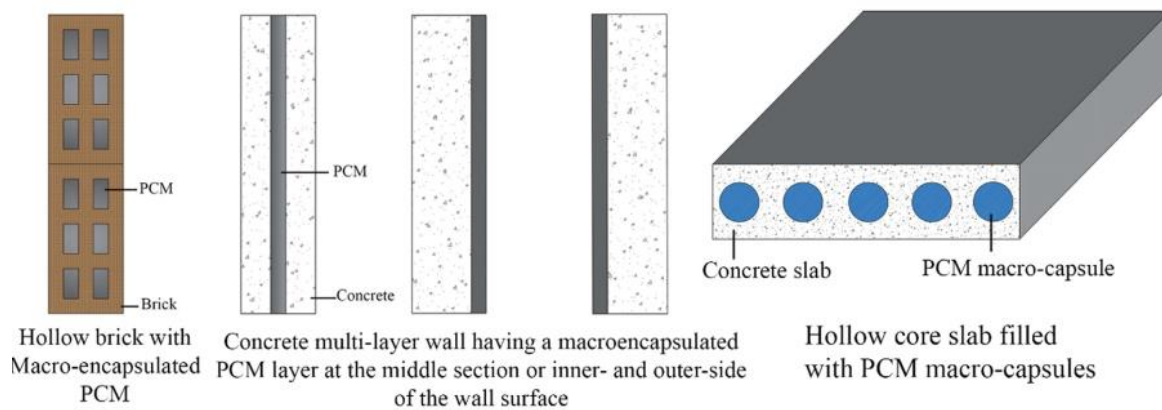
Schematic of PCM macro-encapsulated wall and floor configuration (Marani and Nehdi, 2019)
